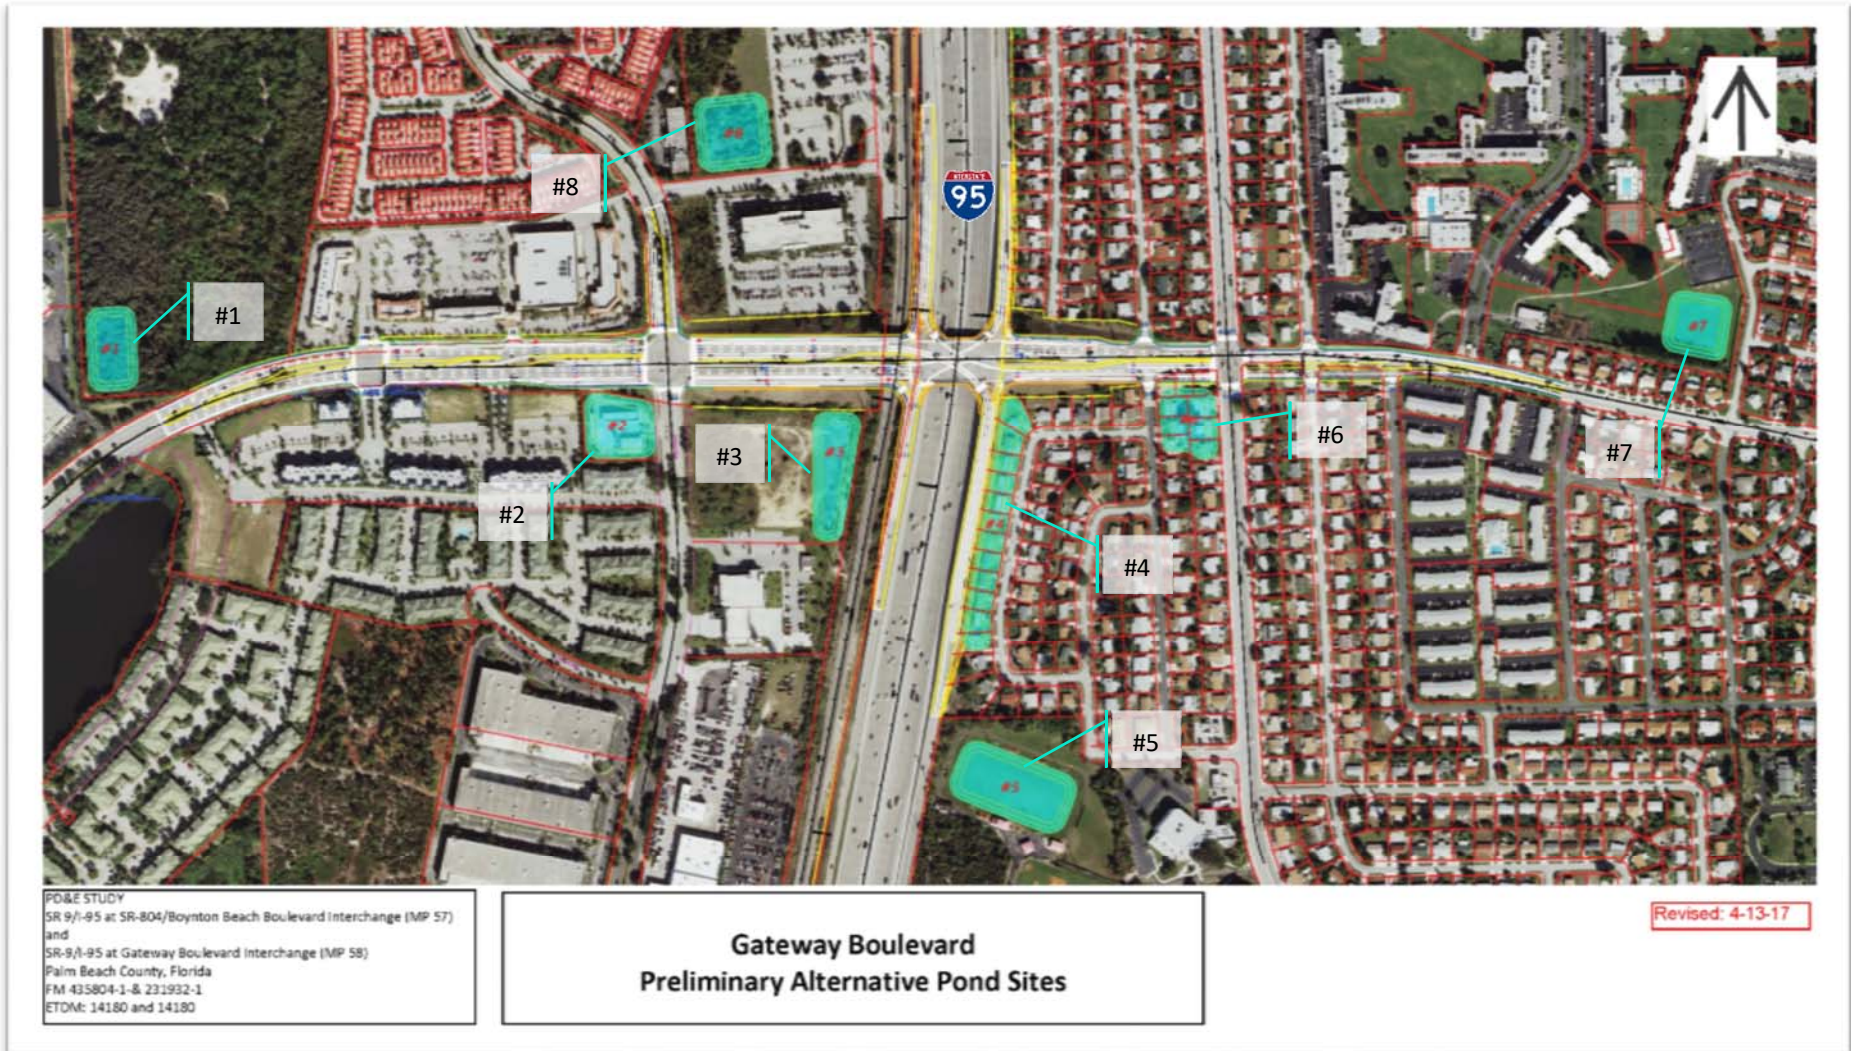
Preliminary Alternative Pond Sites – Gateway Boulevard
